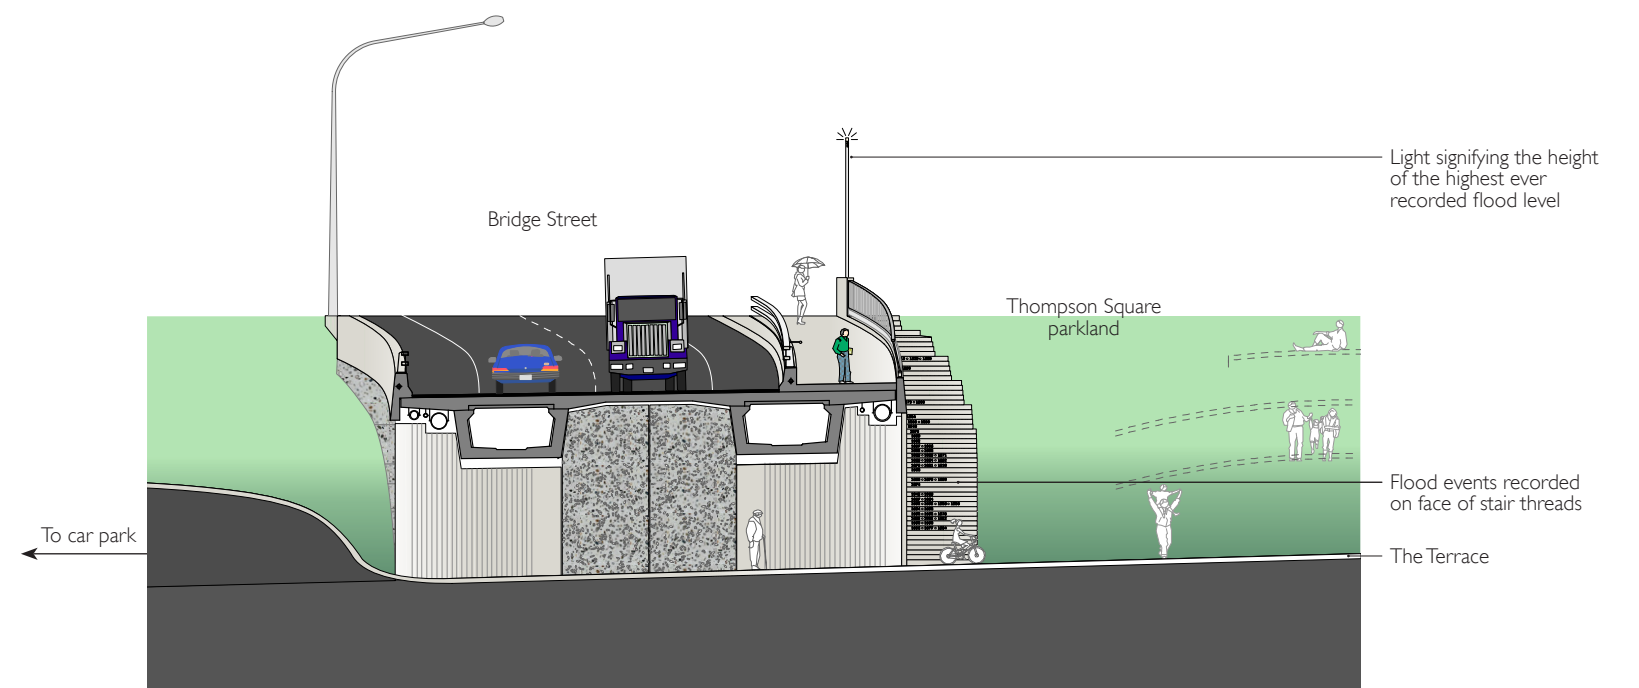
Elevation of southern abutment - facing Thompson Square open space.
